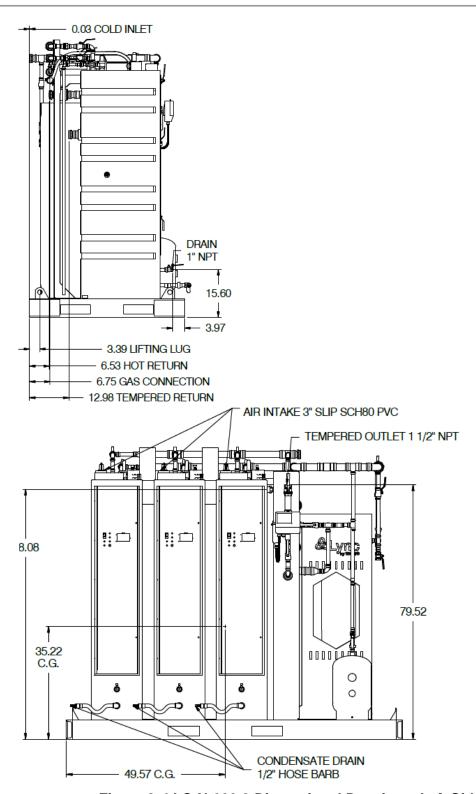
LC-N-600-3 Dimensional Drawing – Left Side & Front View
